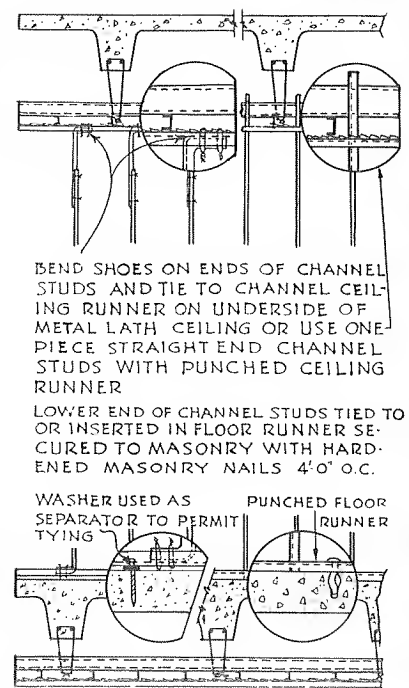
(ABOVE) Upper ends of studs secured to suspended Metal Lath Ceiling; masonry floor.
